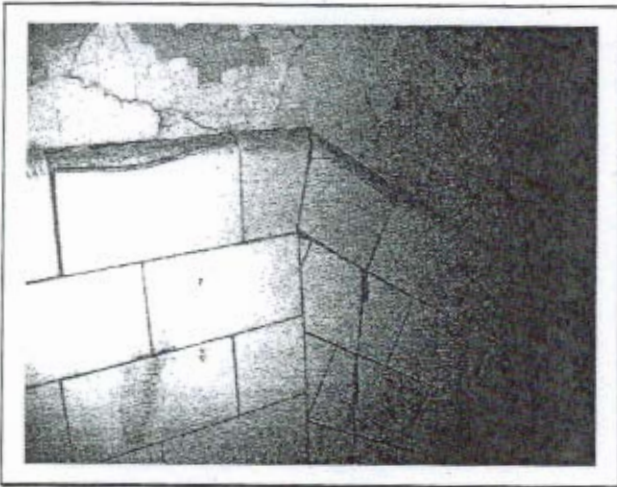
Viewing white ceramic wall, South entrance of Main building.
